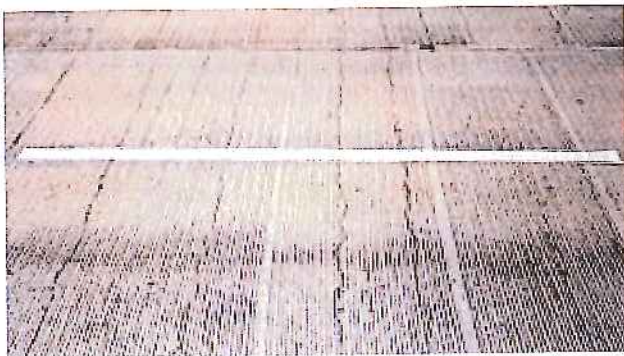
Shrinkage cracks, such as shown on this bridge deck, can be reduced with the use of good concreting practices and shrinkage reducing admixtures. (69883)
